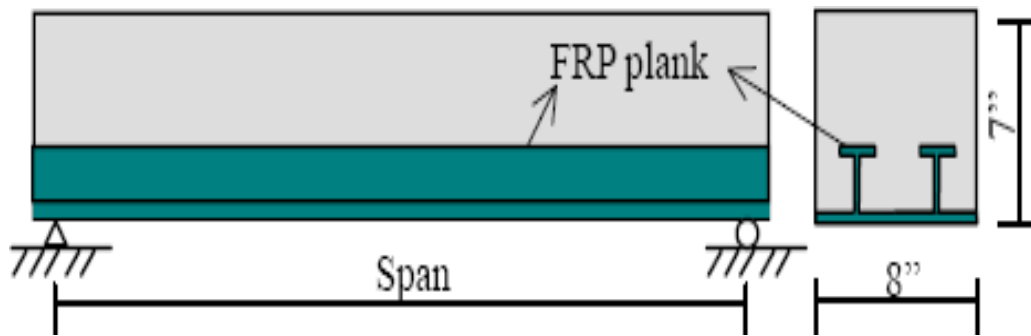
Dimension of FRP Plank Reinforced Beam Specimens (*Bank et al. (2006)*)
